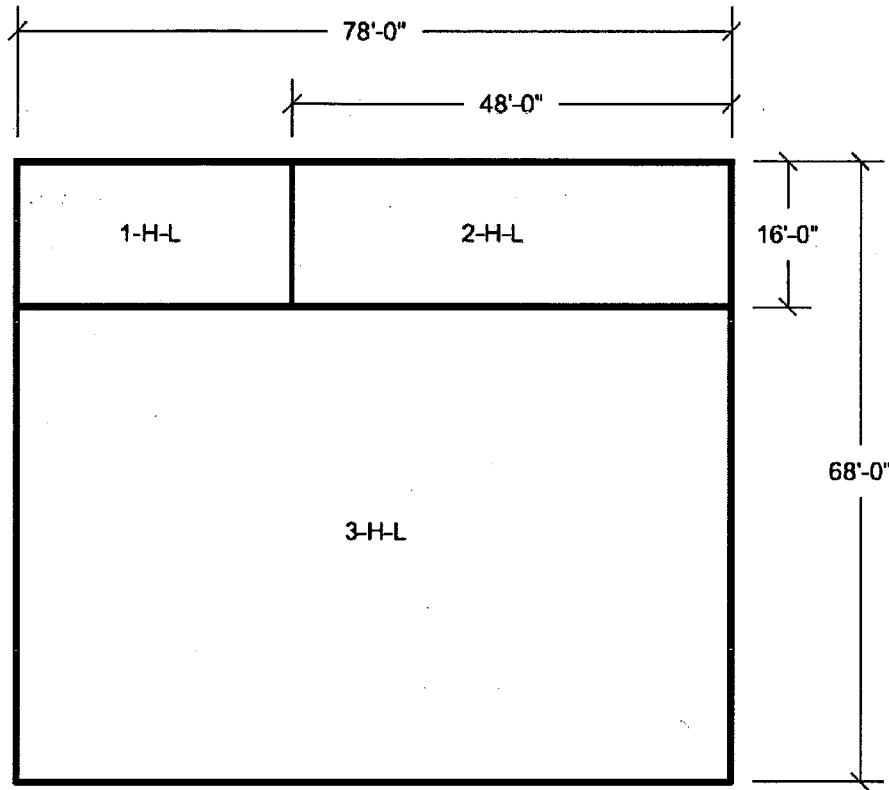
H.6-53 ~~Pumphouse~~ Pump House North Wall Looking South
